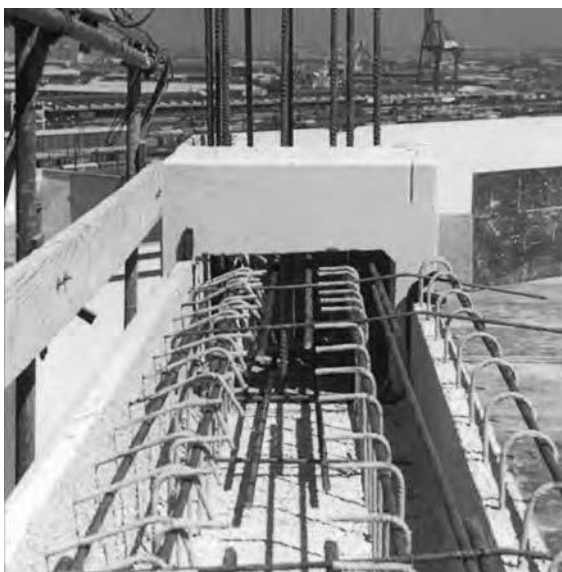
Precast Permanent Formwork used for an Edge beam of a Multi-storey Building
